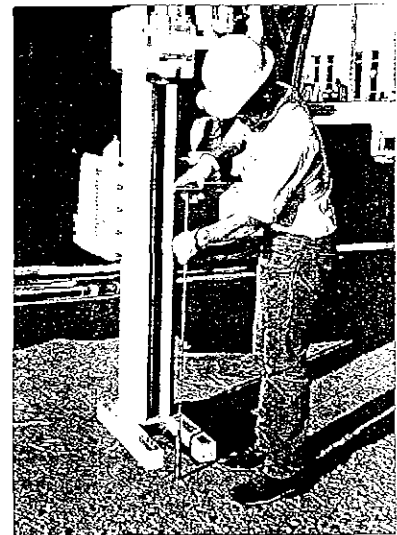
Stop-Pin should be attached to the end extension rod upon removal.
